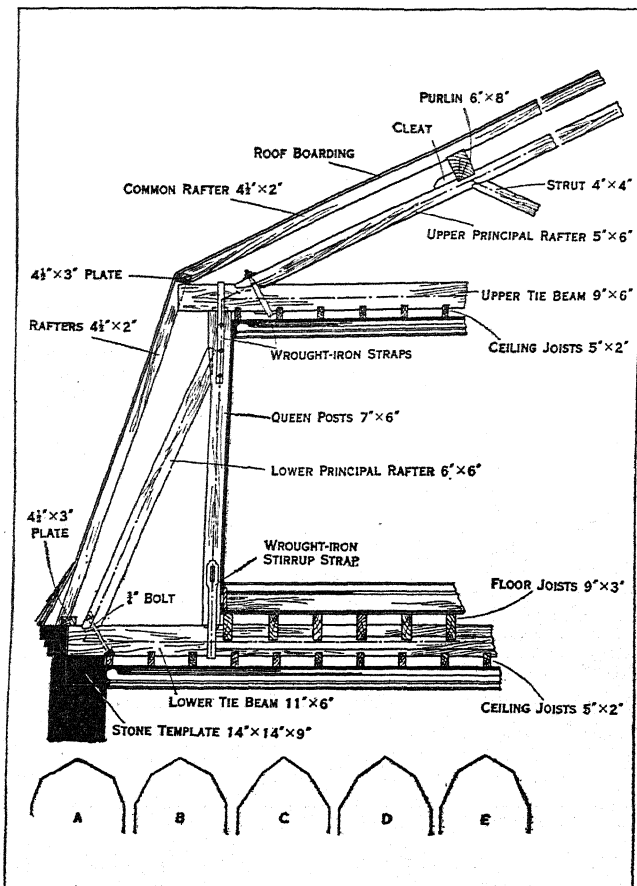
MANSARD ROOF TRUSS: DETAIL OF OUTLINE AS A; OTHER OUTLINES AT B, C, D AND E
